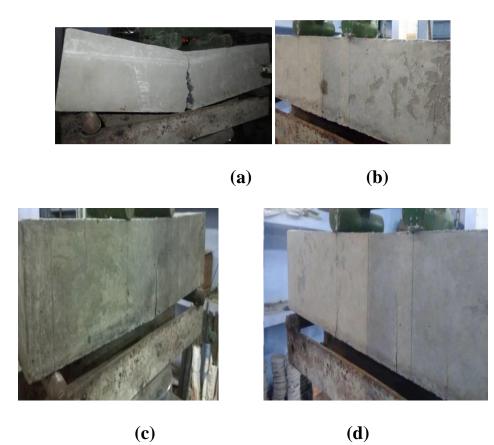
12 Failure of beam, Plain cement concrete, bamboo reinforced concrete beam , steel reinforced concrete beam
